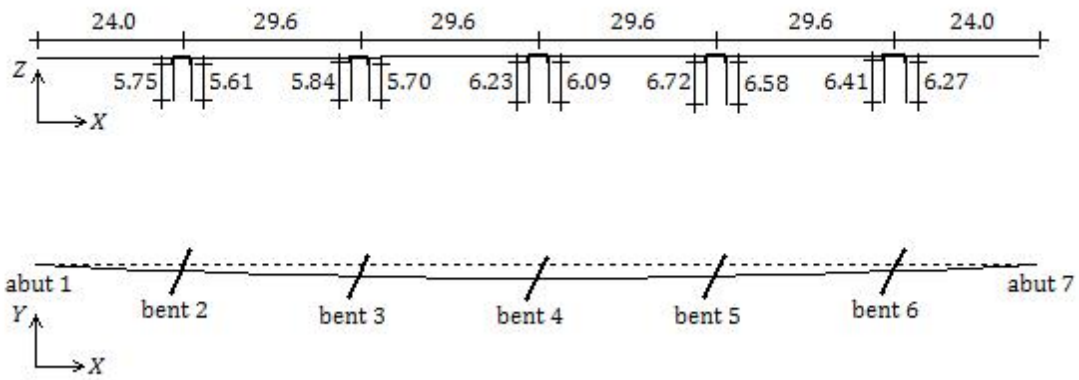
Auburn Ravine Bridge: Elevation and plan (Dimensions are in meters).
